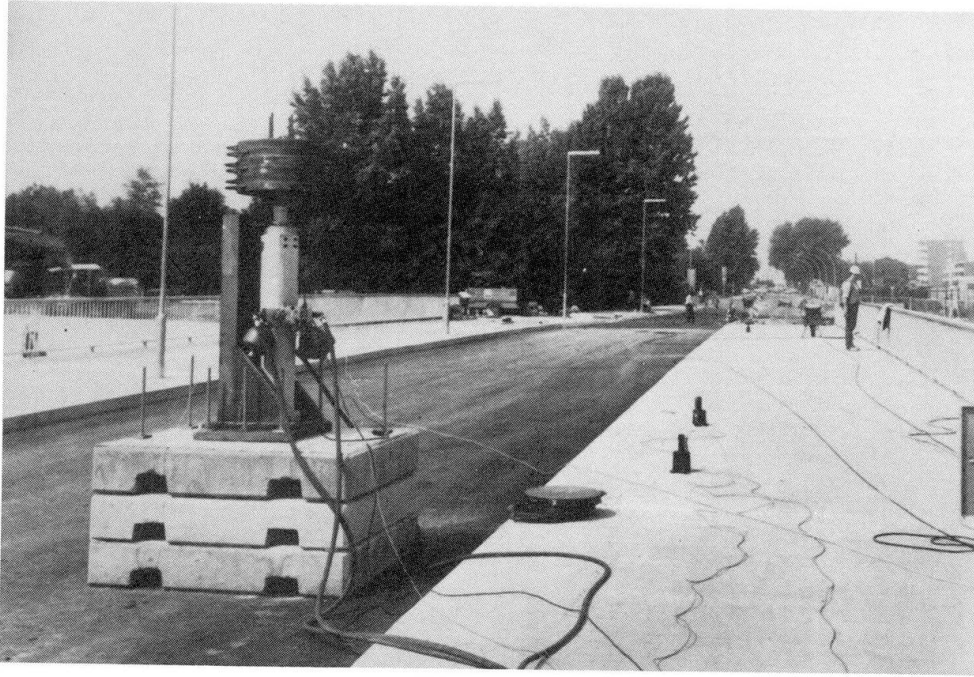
Bridge Ulenbergstraße, hydraulic exciter (1st measurement)
